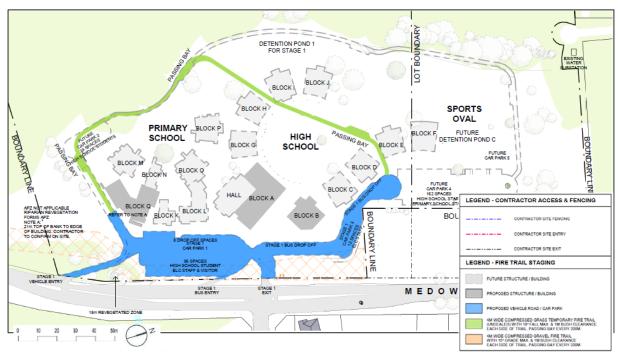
| Site Construction Arrangement – Stages 1a and 1b (source: SRtS 2019)
